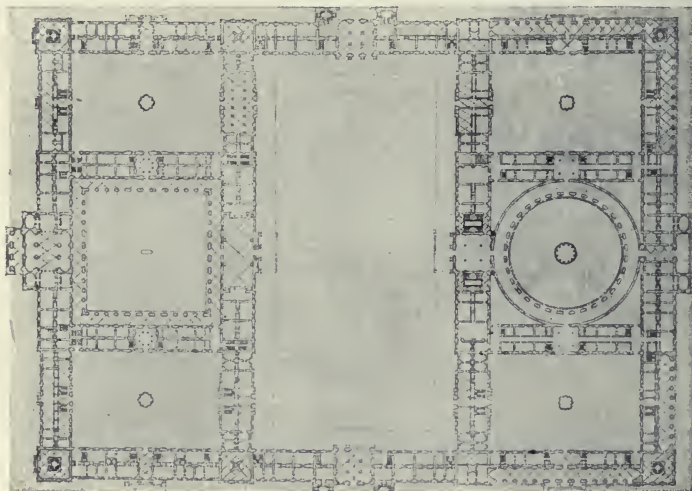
GROUND FLOOR PLAN OF INIGO JONES'S WHITEHALL.
